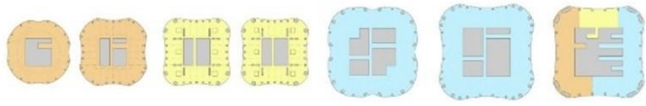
Rounded corners of stepped plans of Tianjin CTF tower [32]
